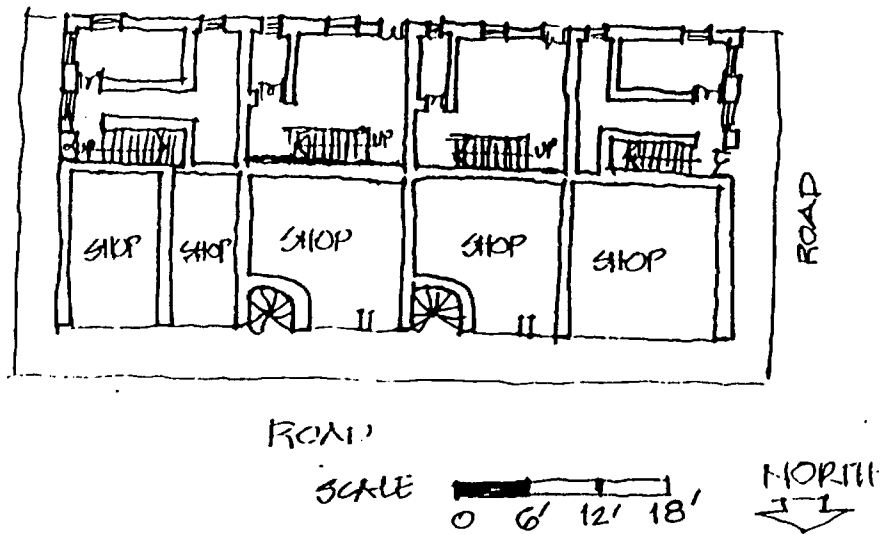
Ground floor plan, shop house, 6, Cemetery road, Khulna
